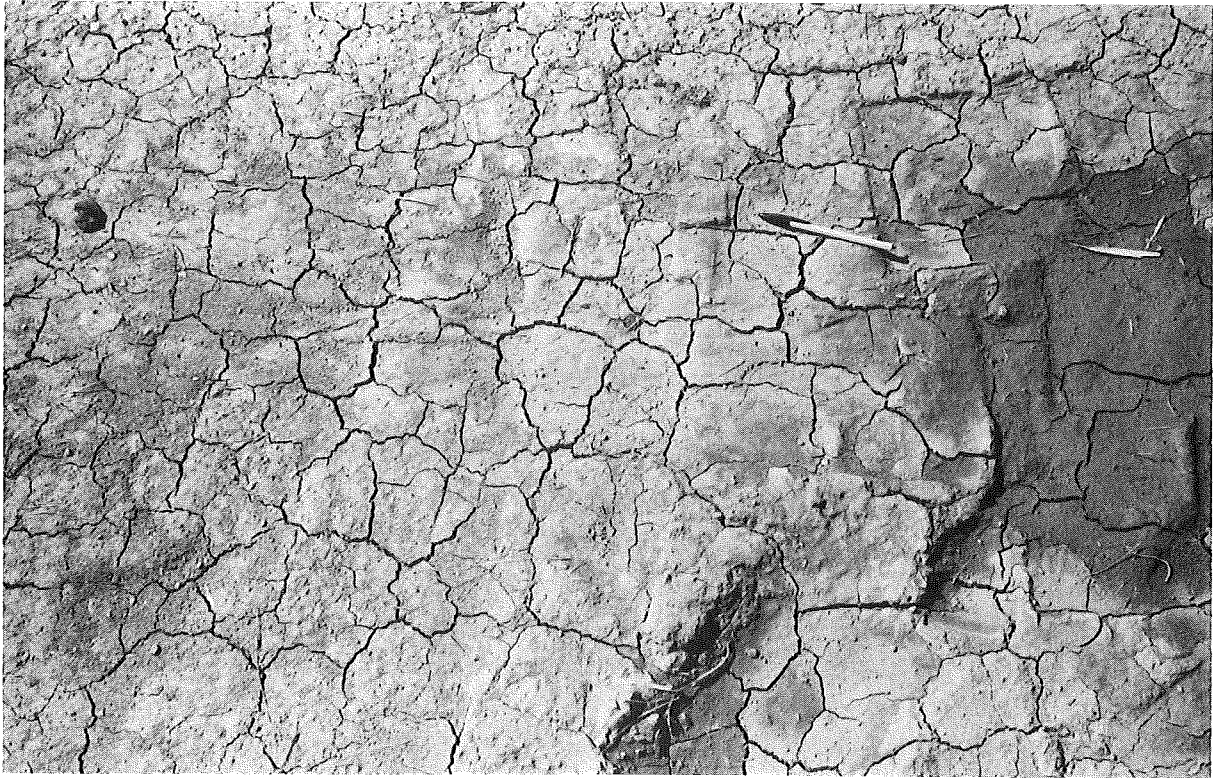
Typical shrinkage cracking after one month exposure (ClaPak section shown).
